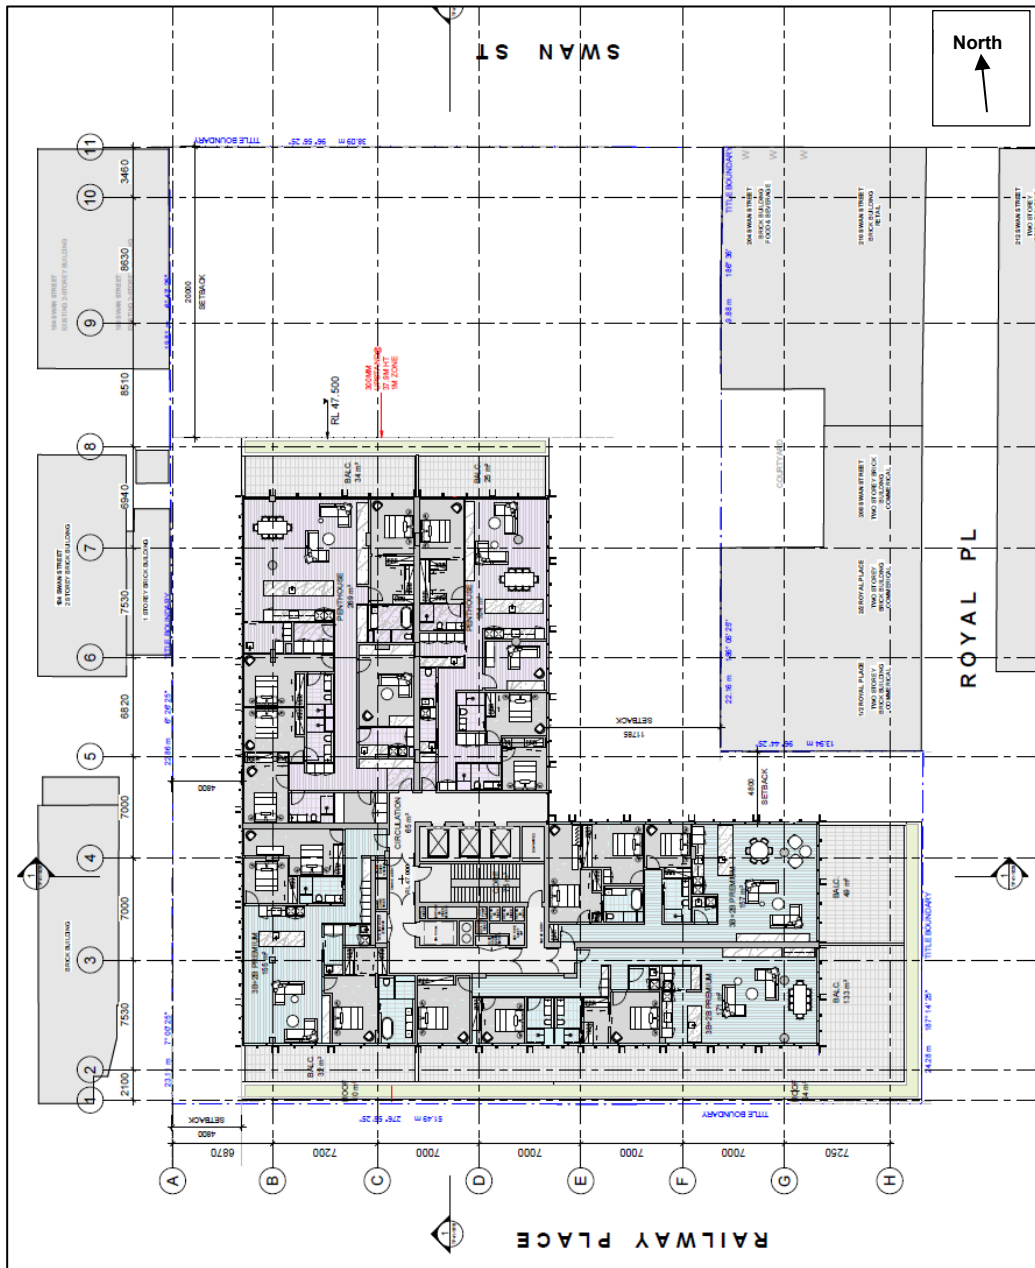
Level 11 floor plan of the proposed 188-202 Swan Street Development.
